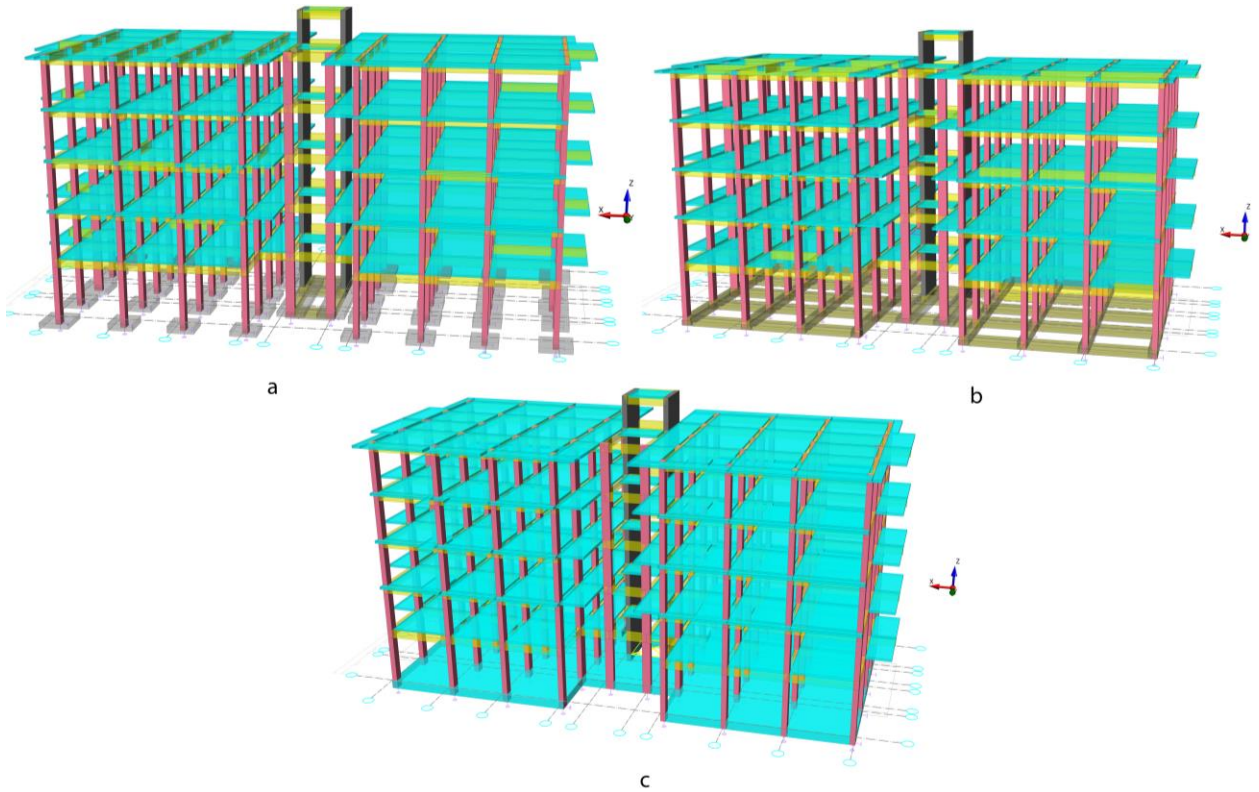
Examples of reinforced concrete design; (a) Isolated foundation; (b) Continuous foundation; (c) Raft foundation.
